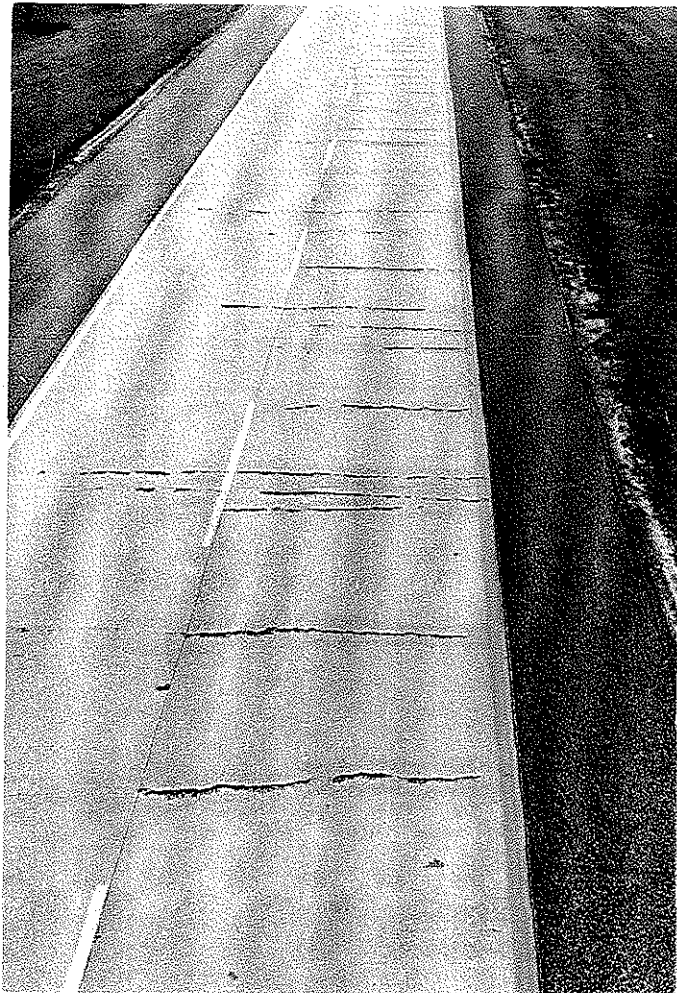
Spalling of the Highway Pavement Made of River Gravel Concrete G1.
